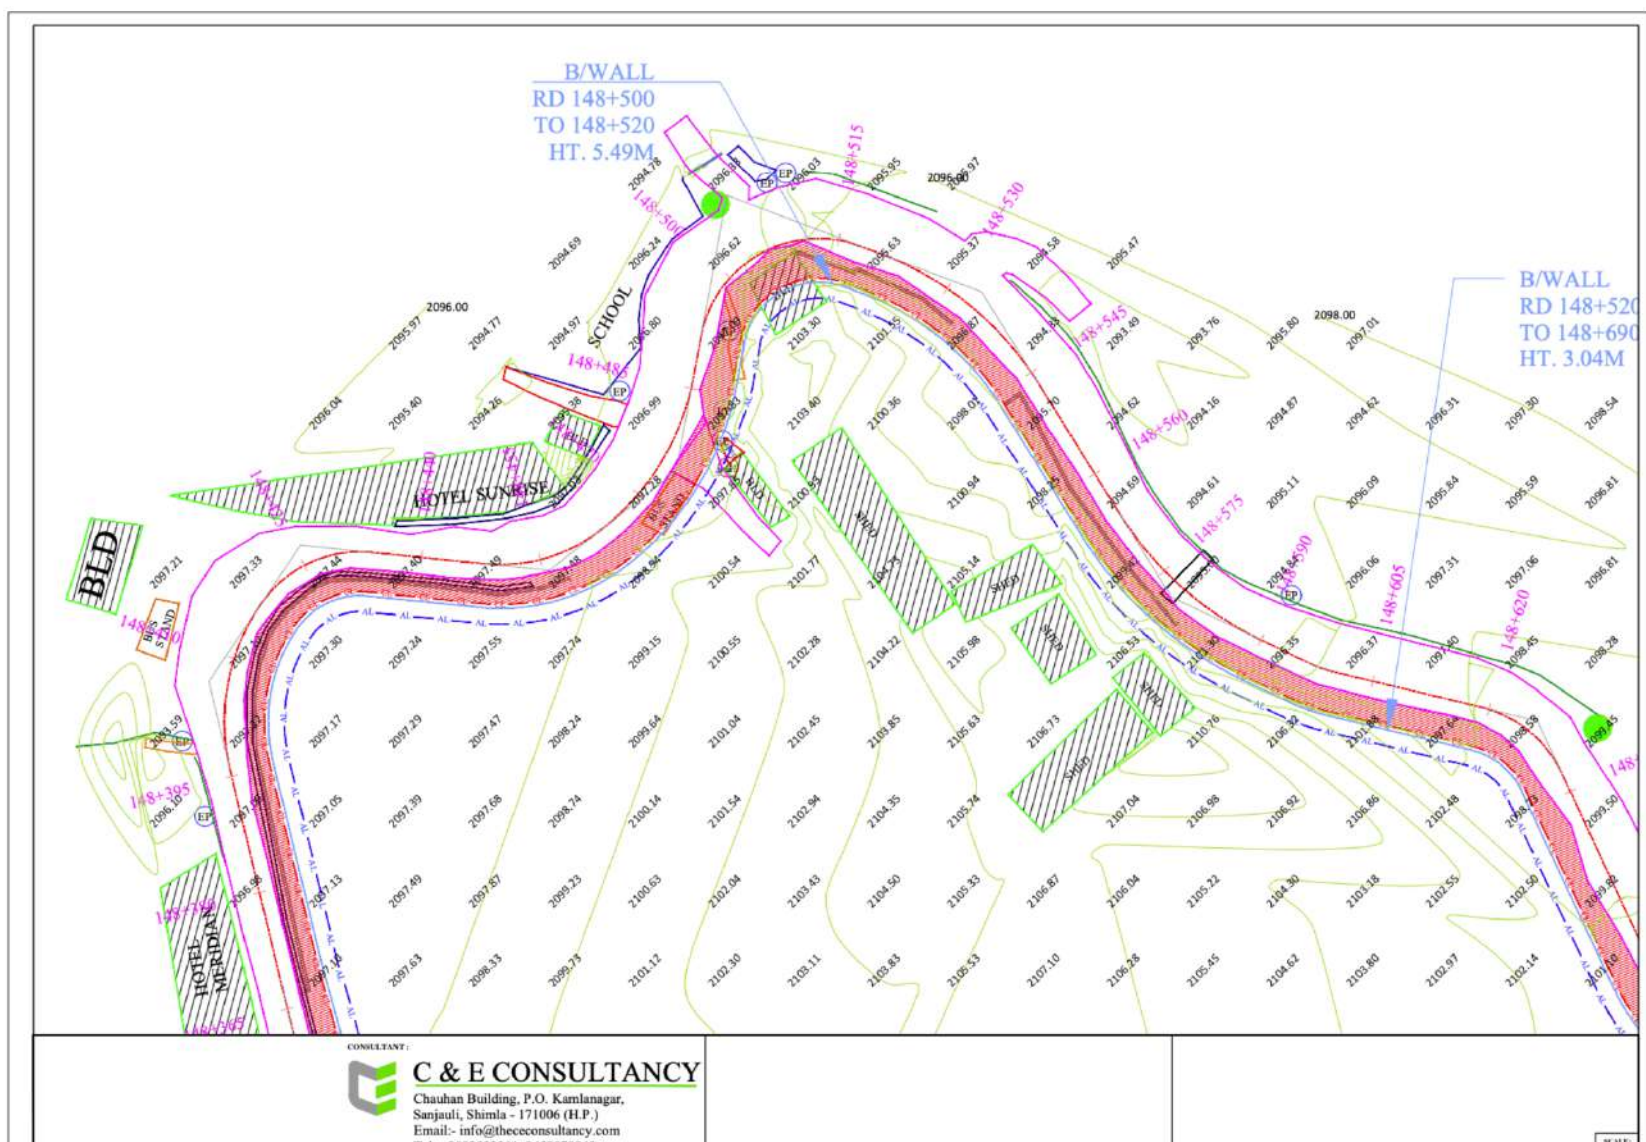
Proposed Road Design for the Improvement of MDR-67 Road Section (Victory Tunnel to Auckland Tunnel) - 5
